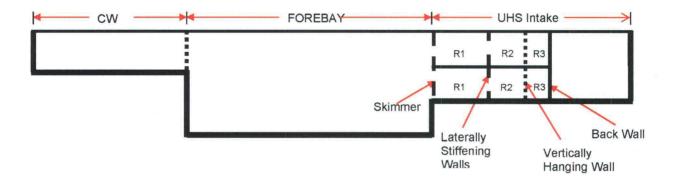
Schematic View of Western Half of CBIS Foundation Floor
